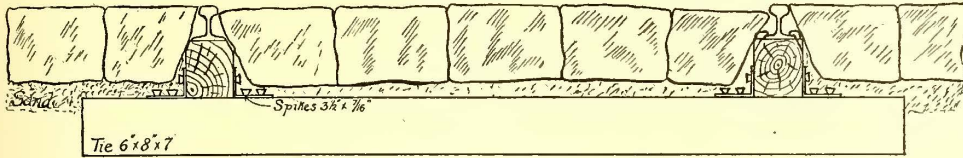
CROSS SECTION OF TRACK—ATLANTA CONSOLIDATED RAILWAY.
